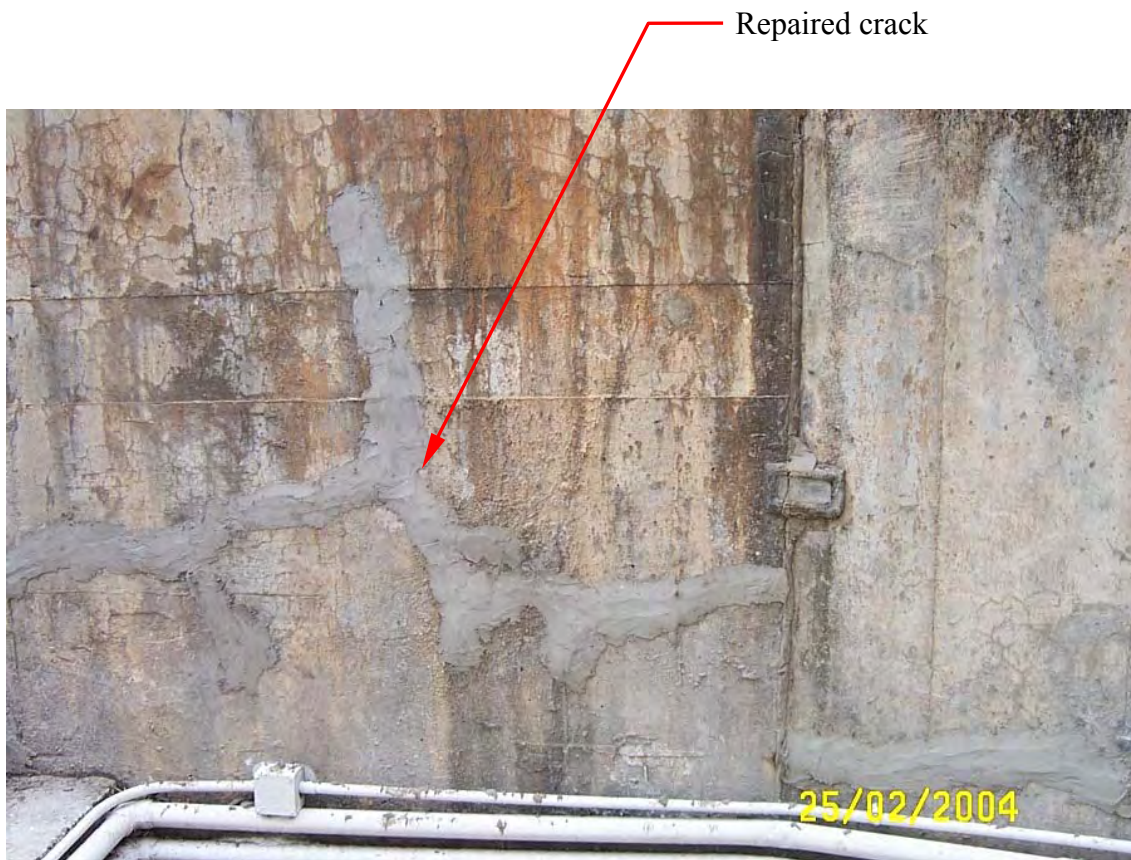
Example of Repaired Cracking in Mass Concrete Gravity Retaining Wall
